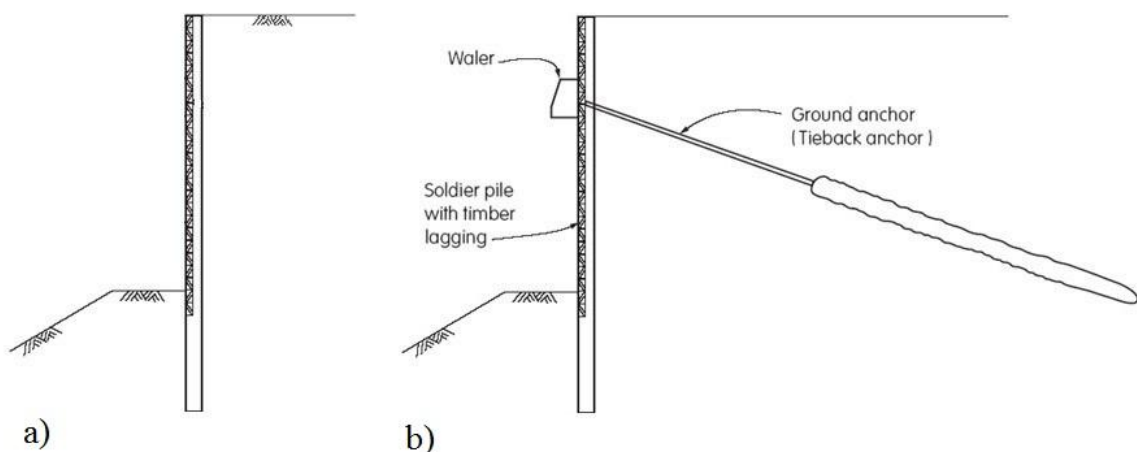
3. a) Embedded retaining wall b) anchored retaining wall
